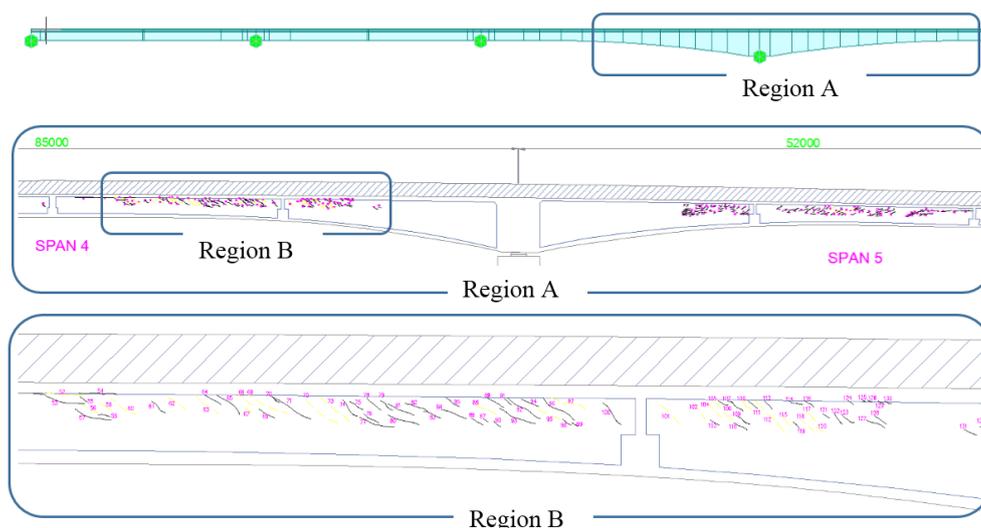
Crack pattern in the inside of the box girder of bridge
